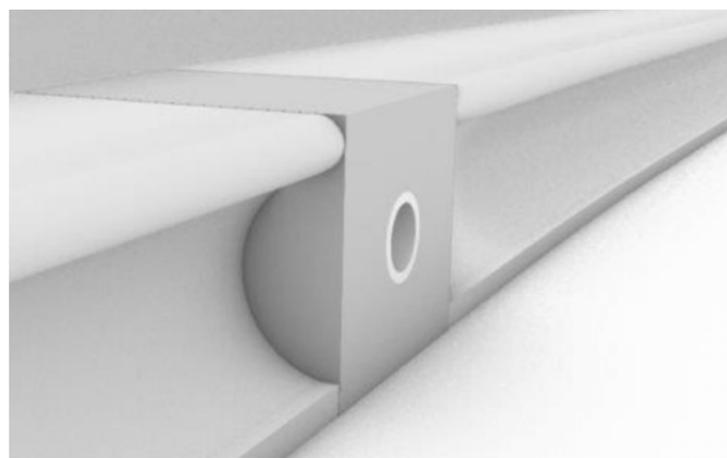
Indicative stormwater outfall penetration through seawall.
